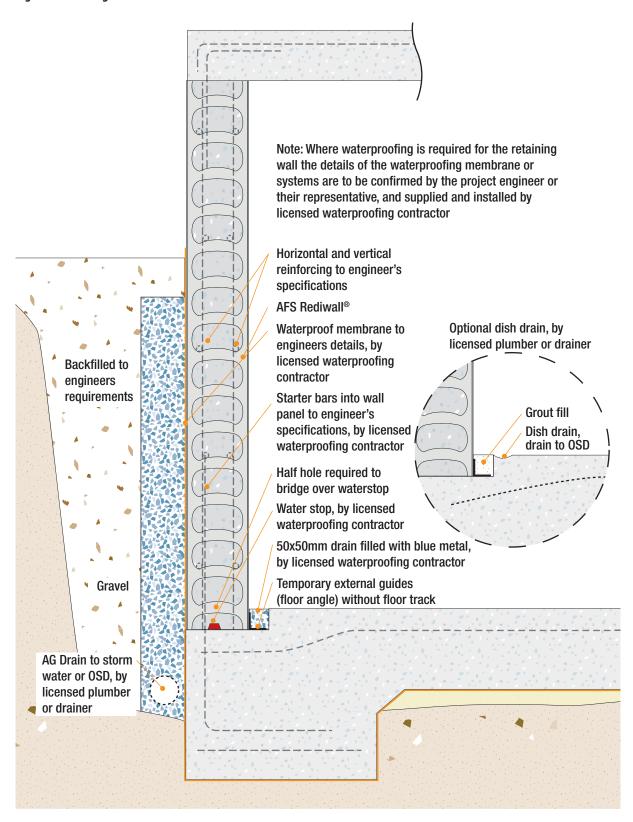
Cantilevered Retaining Wall (maximum height 3400mm)
